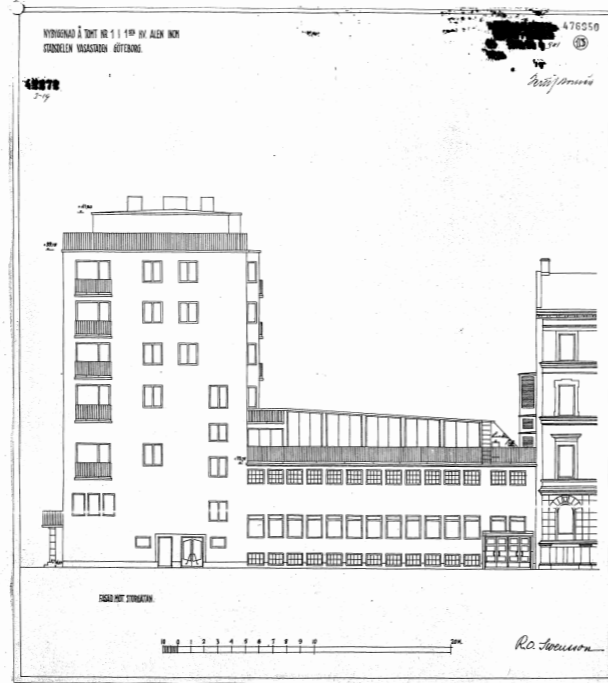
South elevation. Original drawing (1940) (Göteborgs Stad., n.d.)
